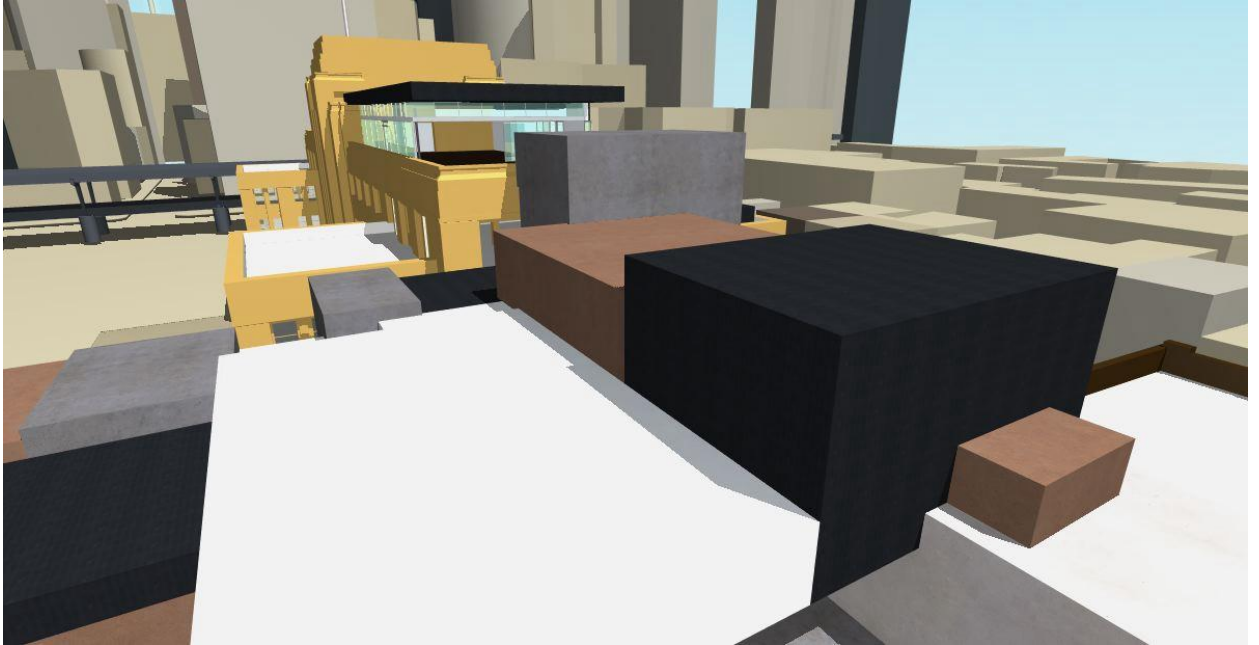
Level 6 stair as originally proposed and as amended, looking east
